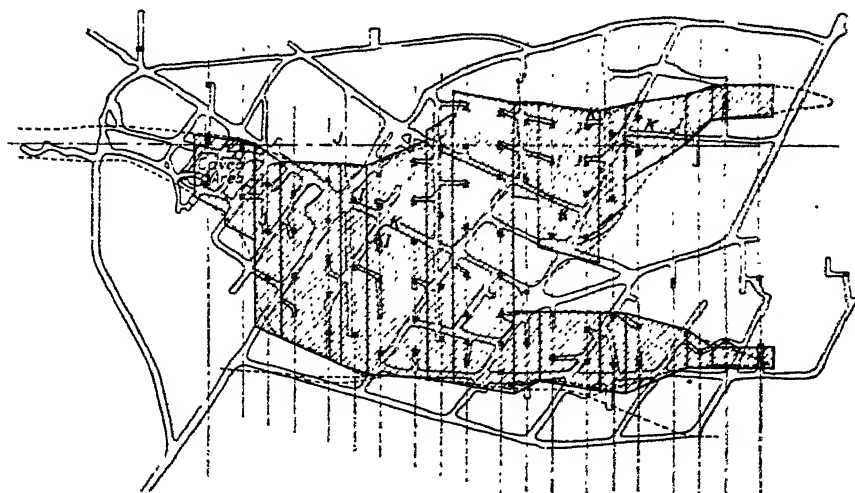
PLAN OF MAIN OR MINING LEVEL SHOWING OUTLINE OF STOPE AS MINED. ALSO STOPE DEVELOPMENT AND STOPE PREPARATION WORK AS COMPLETED. J. PILLAR CROSSCUTS. K. APPROACHES TO MINING RAISES. I. MINING RAISES.
